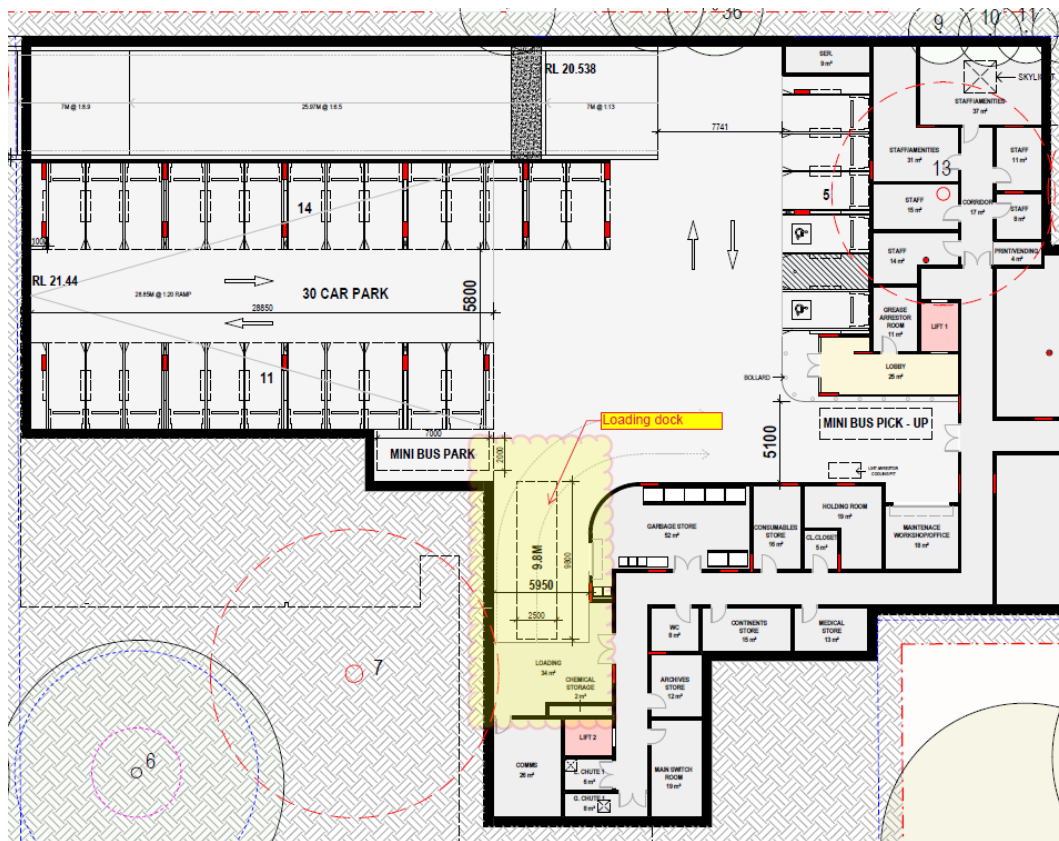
loading dock and internal waste area are concealed from the main road by a walled courtyard.
